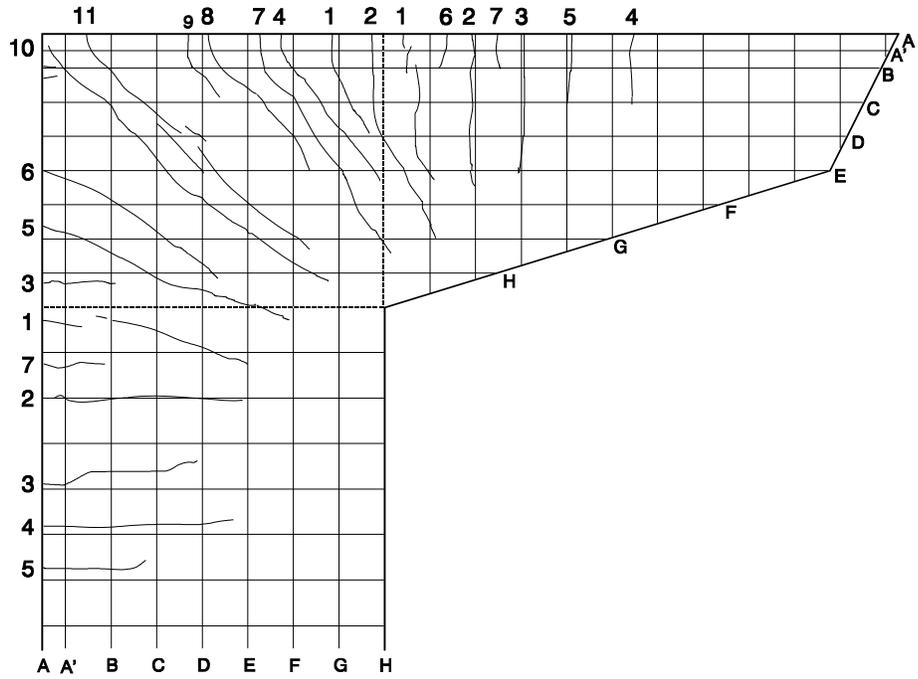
POJ-RC-100 cracking pattern on north face of specimen at service load
